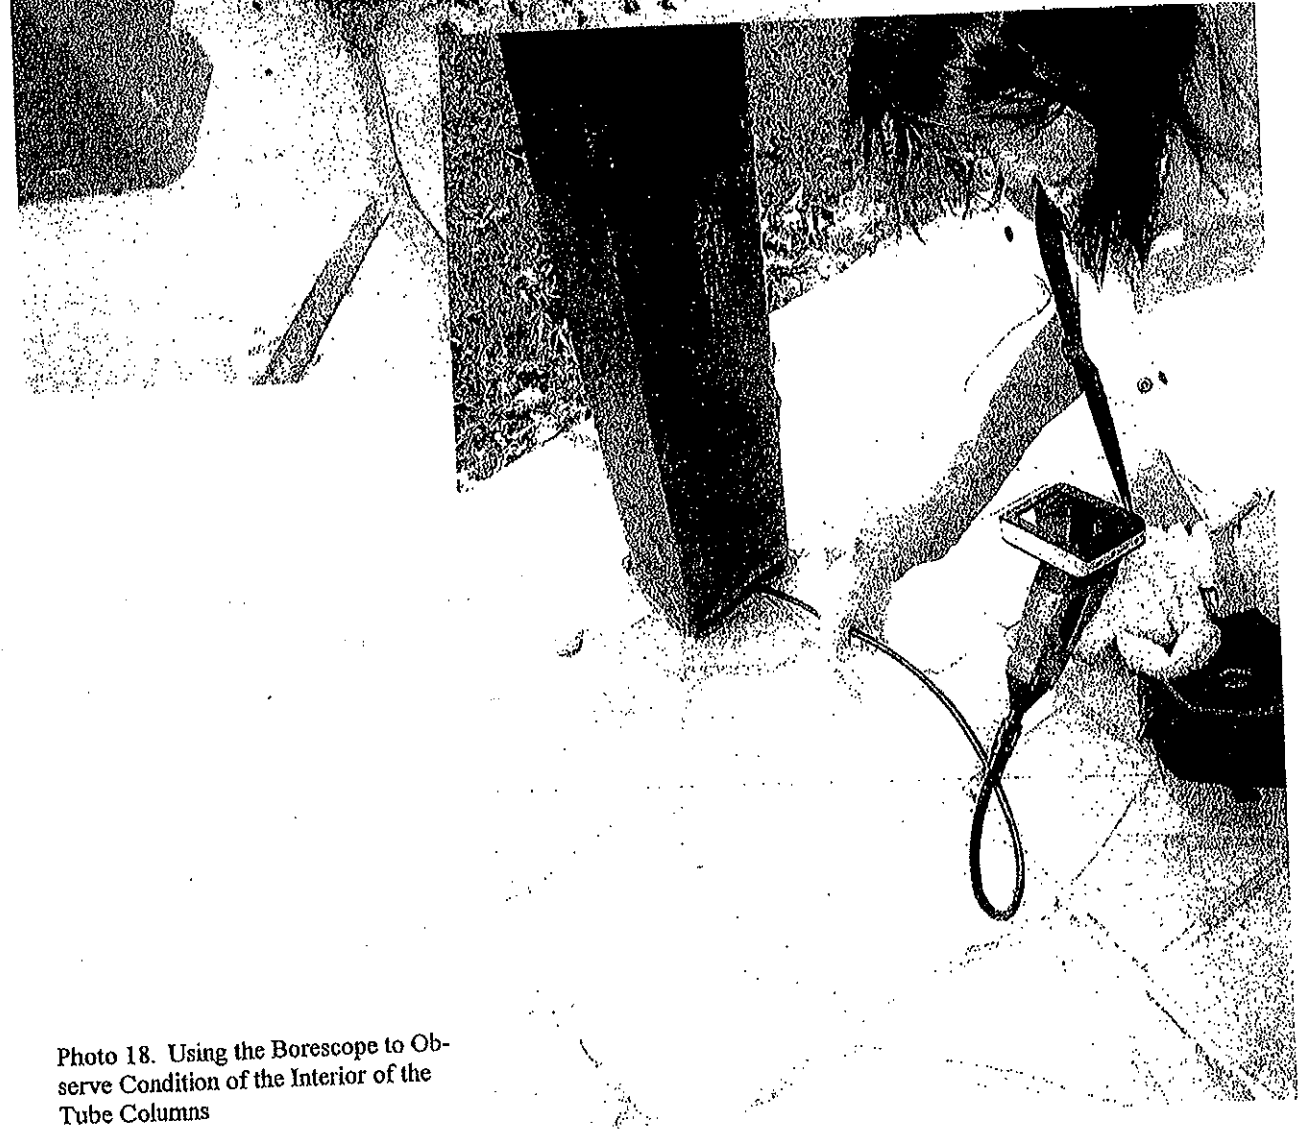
Using the Borescope to Observe Condition of the Interior of the Tube Columns
